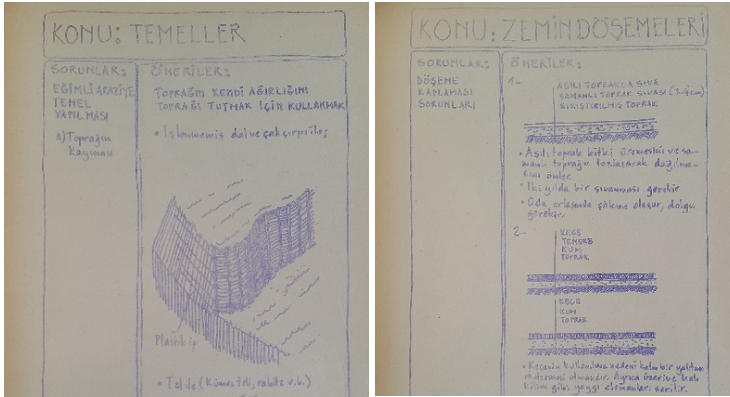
METU ARCH302 Studio Works. The logbook was the outcome of Mehmet Adam's studio section between 1978 and 1979.
